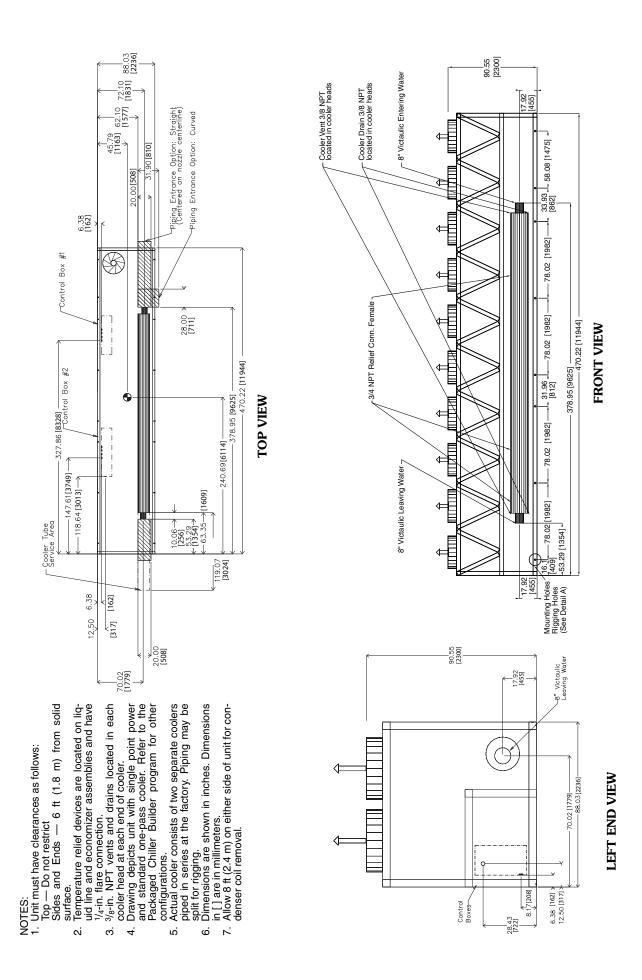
30XA400 Air-Cooled Liquid Chiller with Single Point Connections Dimensions
